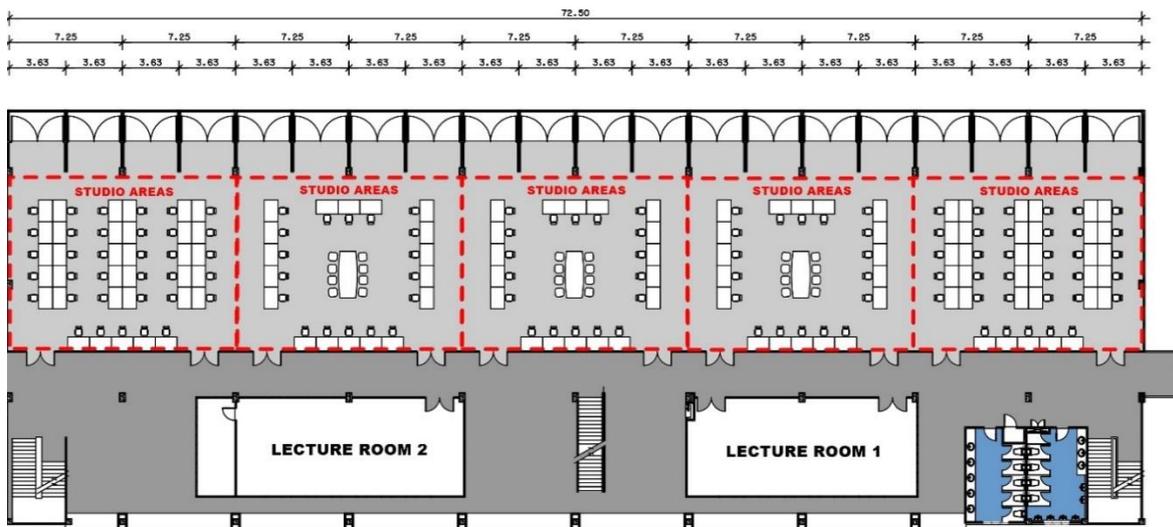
Studio floor plan of School of Architecture & Design, Walailak University.
